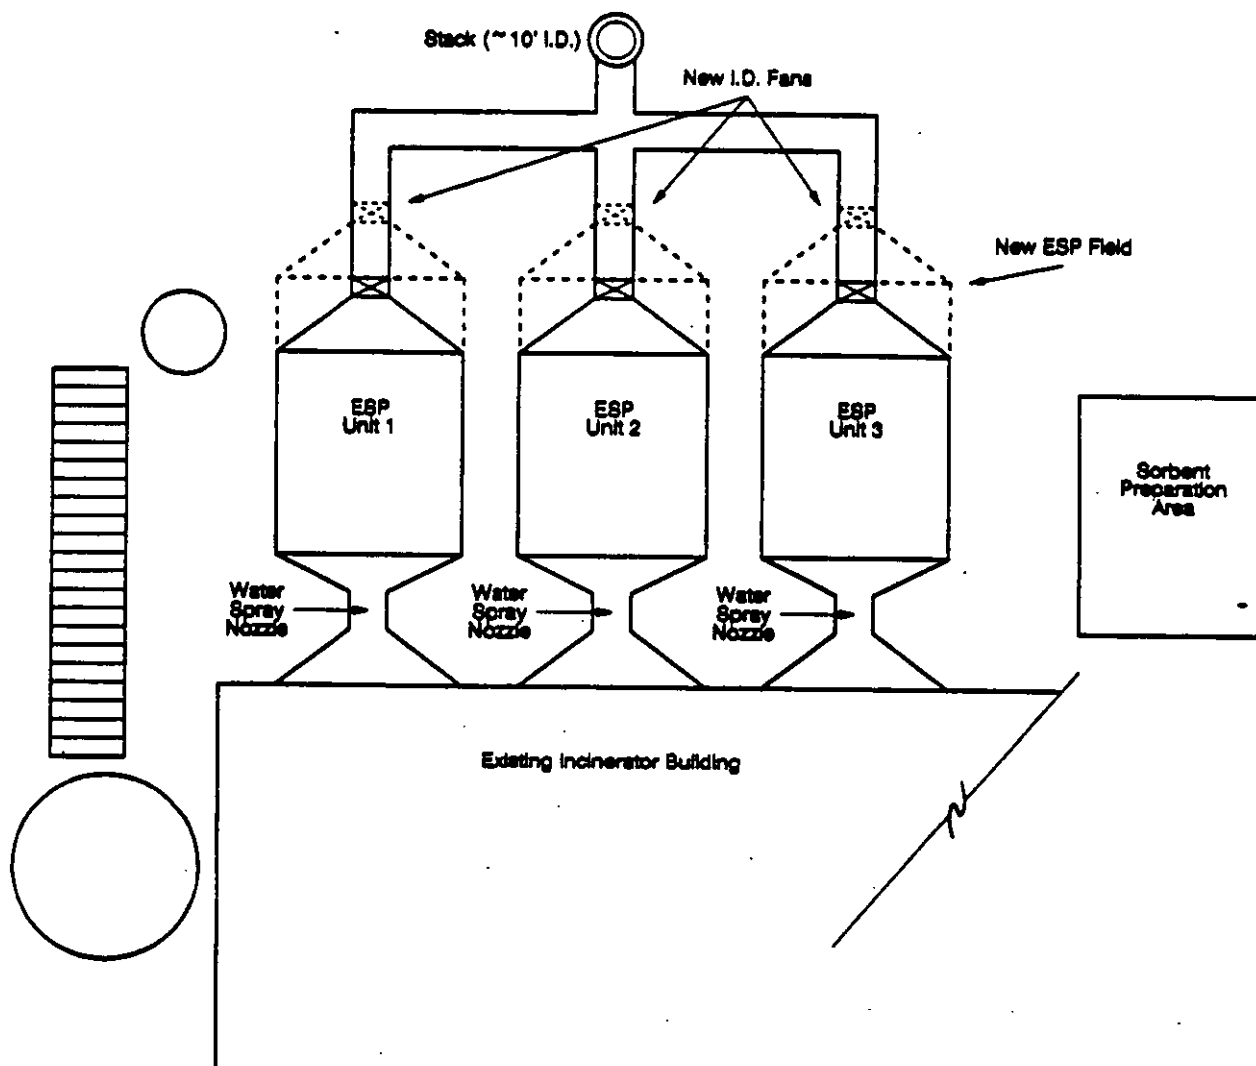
Plot Plan of Sorbent Injection Equipment Arrangement
